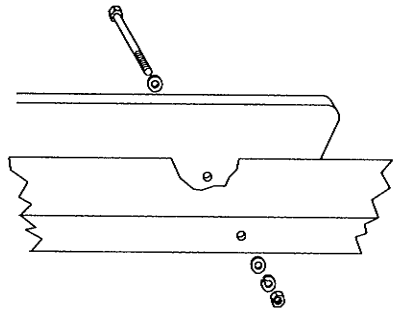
DETAIL OF MOUNTING TERMINAL MARKER TO POST
